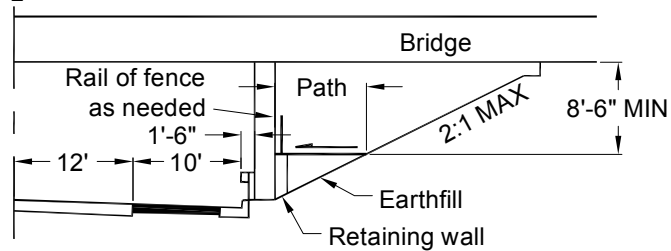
MULTIUSE PATH – TUNNELS
